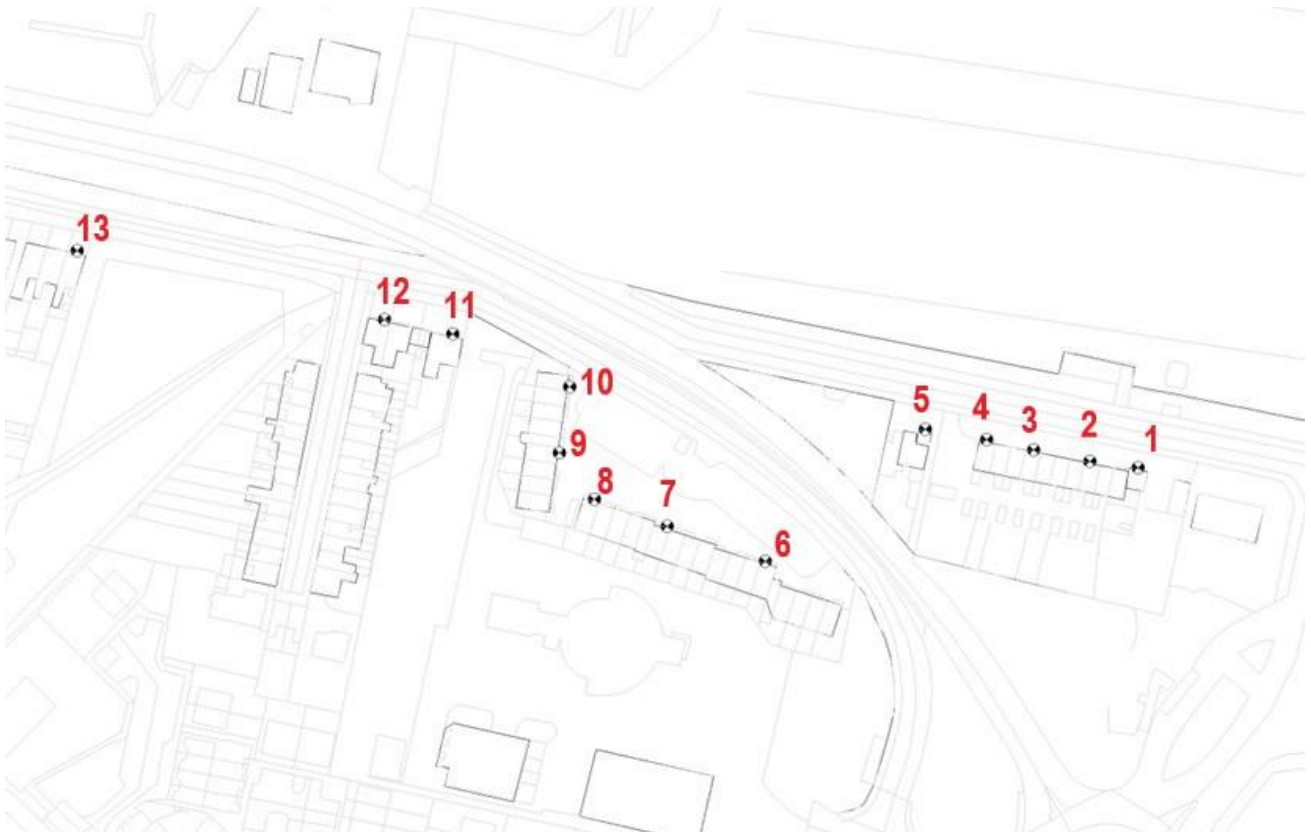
Location Specific Properties Along Pigeon House Road / Coastguard Cottages to Illustrate Worst-Case Construction Noise Levels in Table 12.1.14
